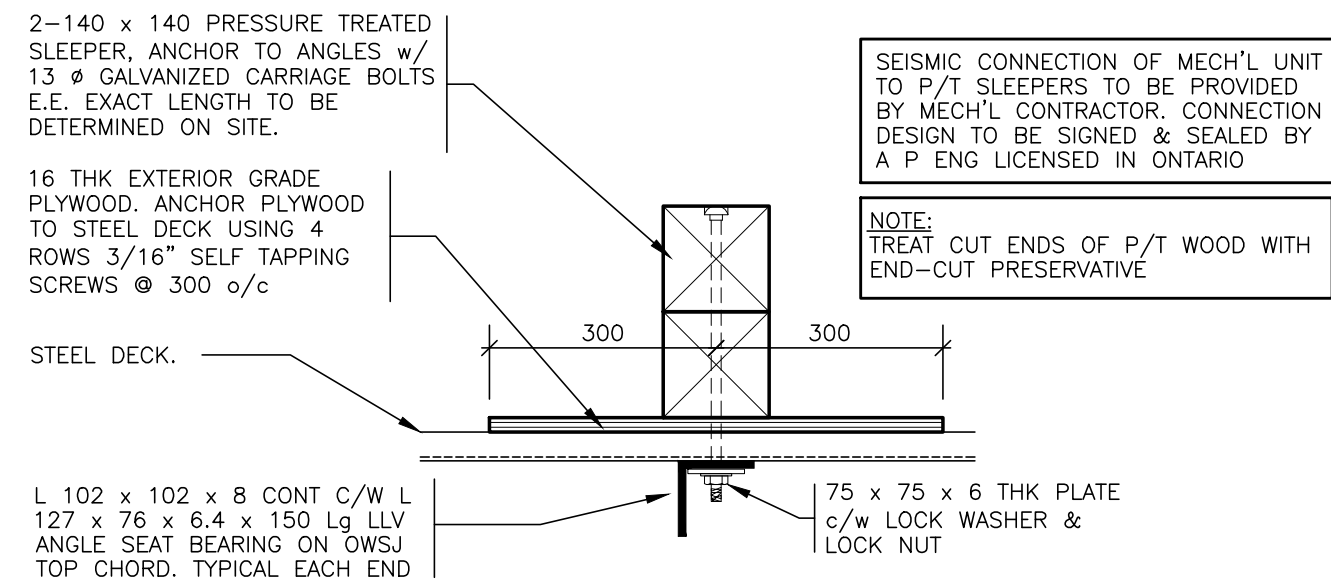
DETAIL-WOOD SLEEPER SUPPORTS AT ROOF TOP PIPE SUPPORT LOCATIONS
